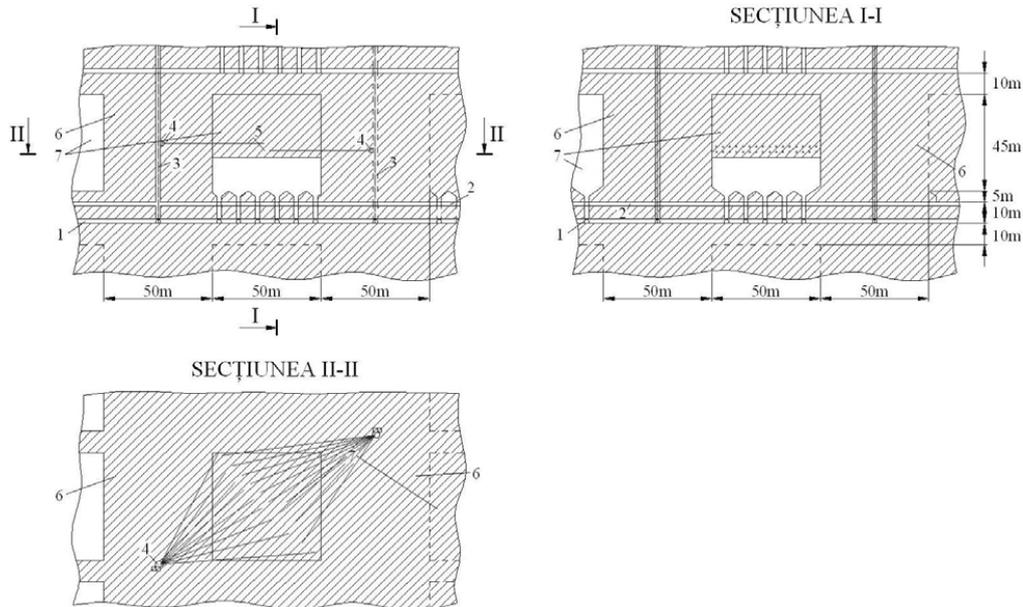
Sublevel stopping, with horizontal fan drillings mining method
